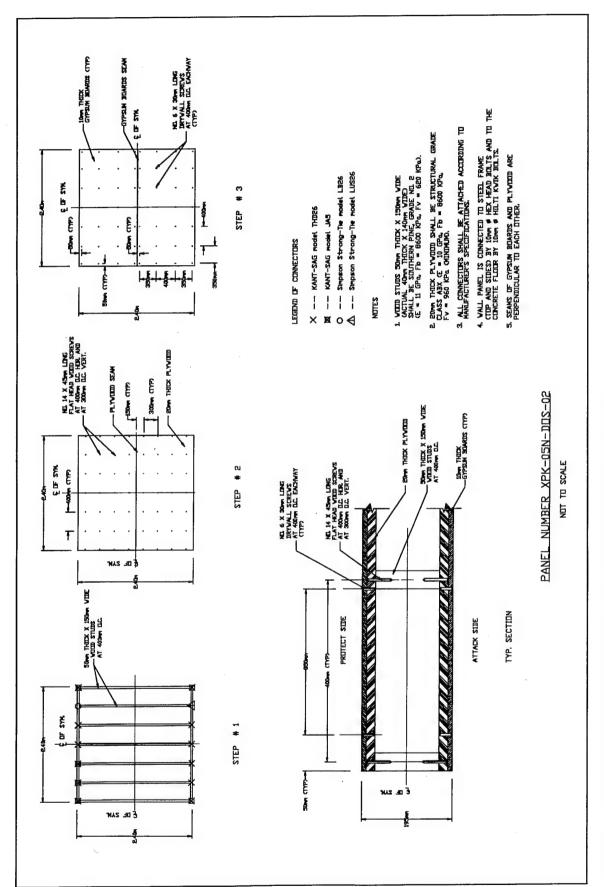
Engineering drawings for wall panel XPK-05N-DOS-02 (SI units)
